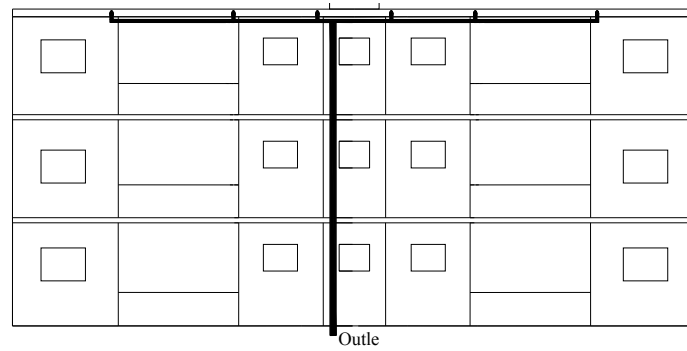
Layout of Pipe System of RWH for Building-14 in KUET Campus
